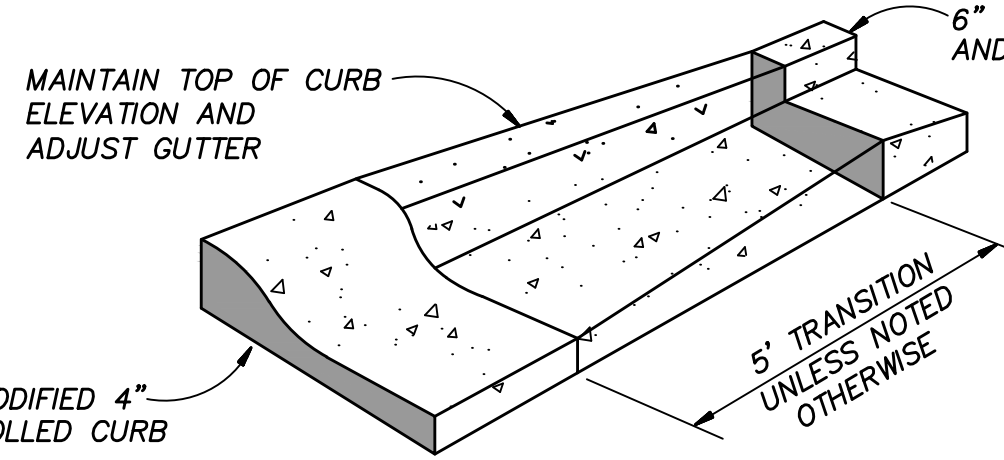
DETAIL ~ MODIFIED TYPE "A" 4" ROLLED CURB
